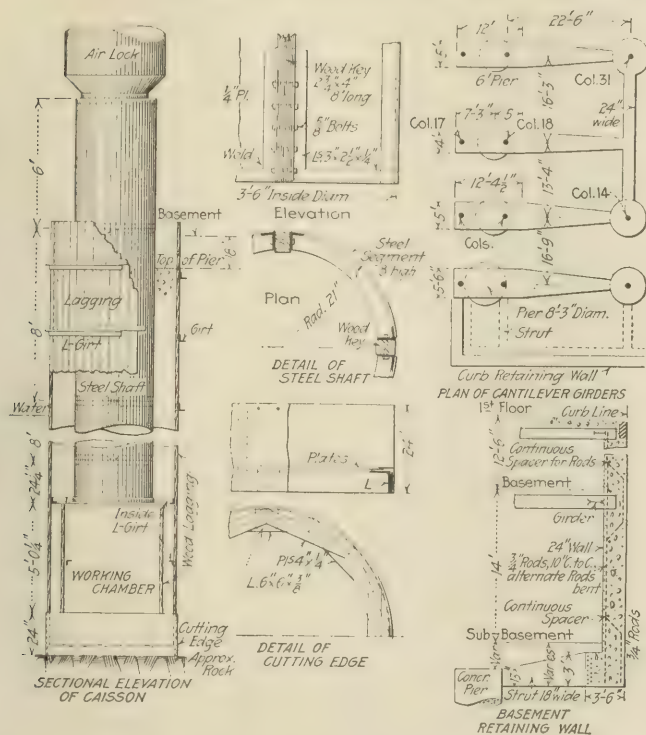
SHAFT FOR FOUNDATION PIERS AND CANTILEVER FOOTINGS
